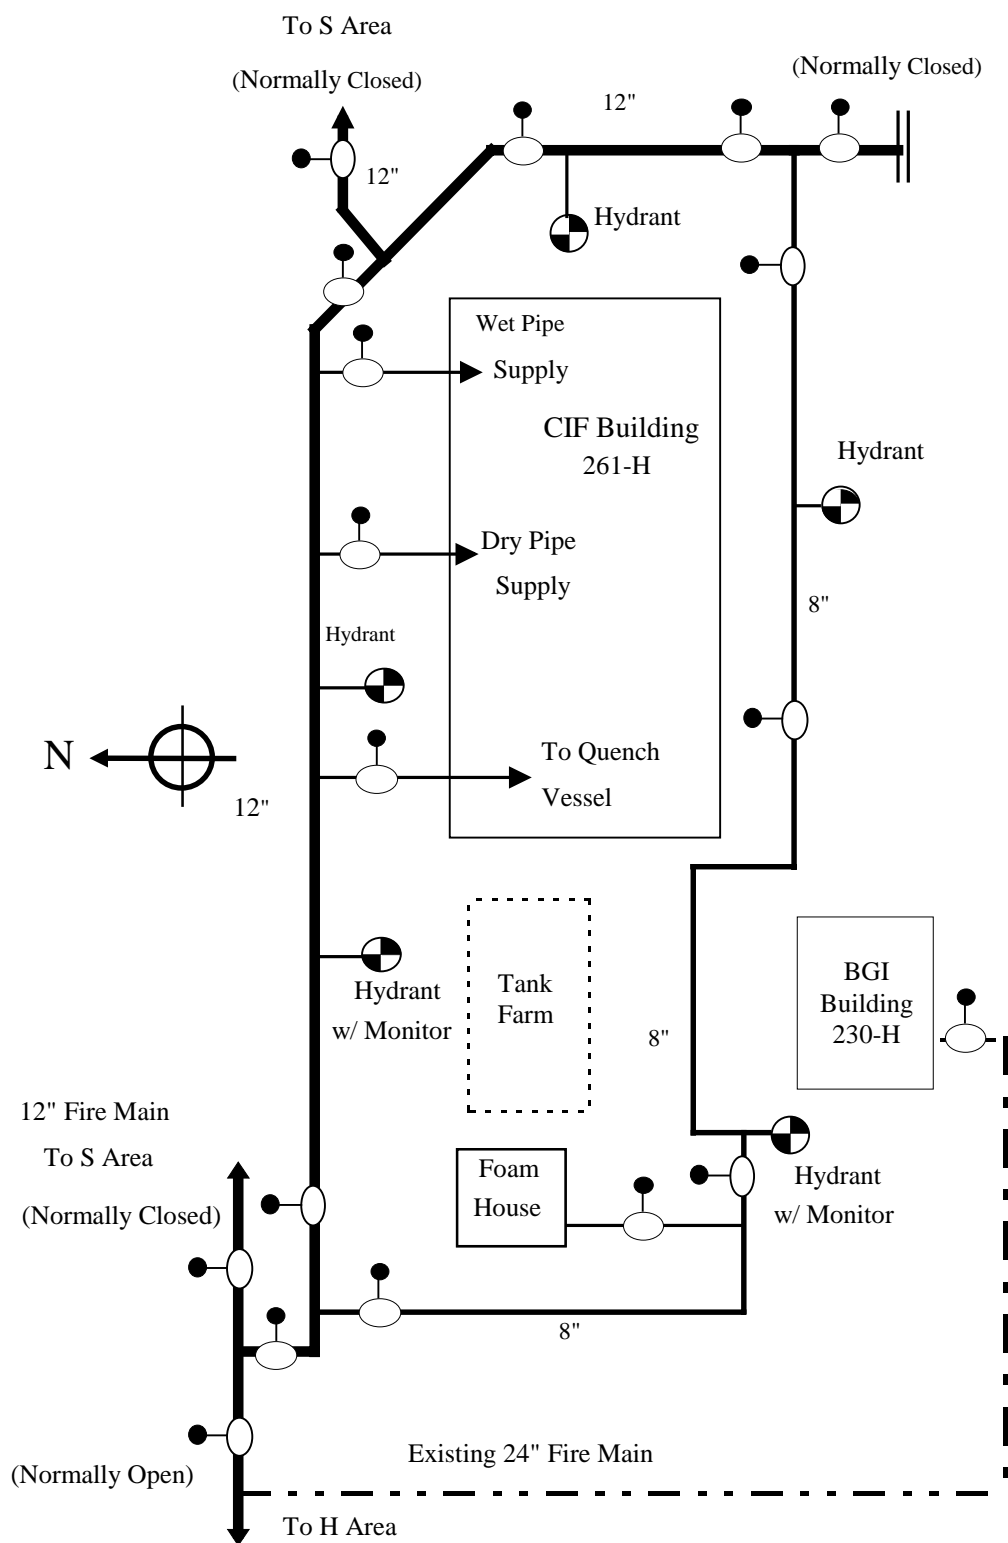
Outside Underground (OSUG) Fire Protection Loop
